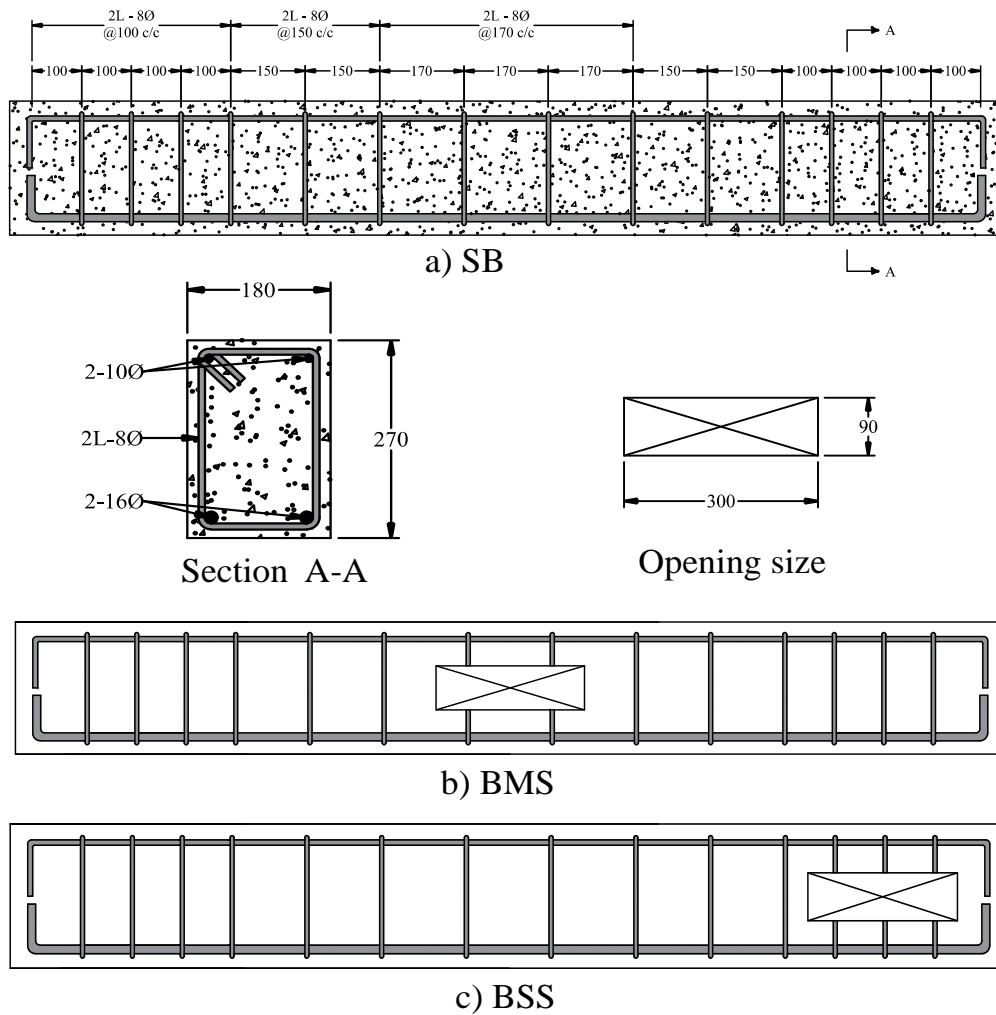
Reinforcement detailing of Beam specimen (All dimensions are in mm)
